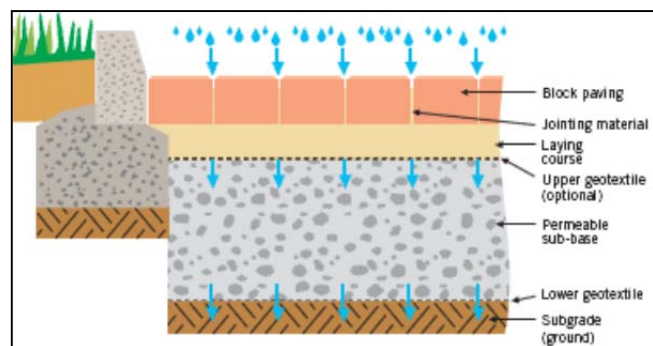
Typical example through a section of permeable paving that will be used on high permeability soils on the site (Source: Stormwater Management Plan, May 2013, Bosch Stemele).
